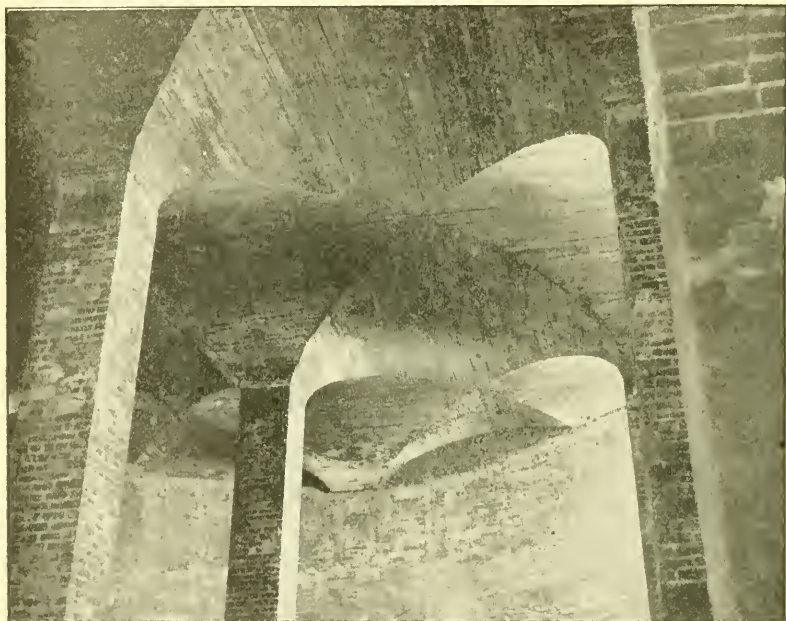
VIEW OF GROINED CONCRETE ROOF, SEPTEMBER 23, 1899.
